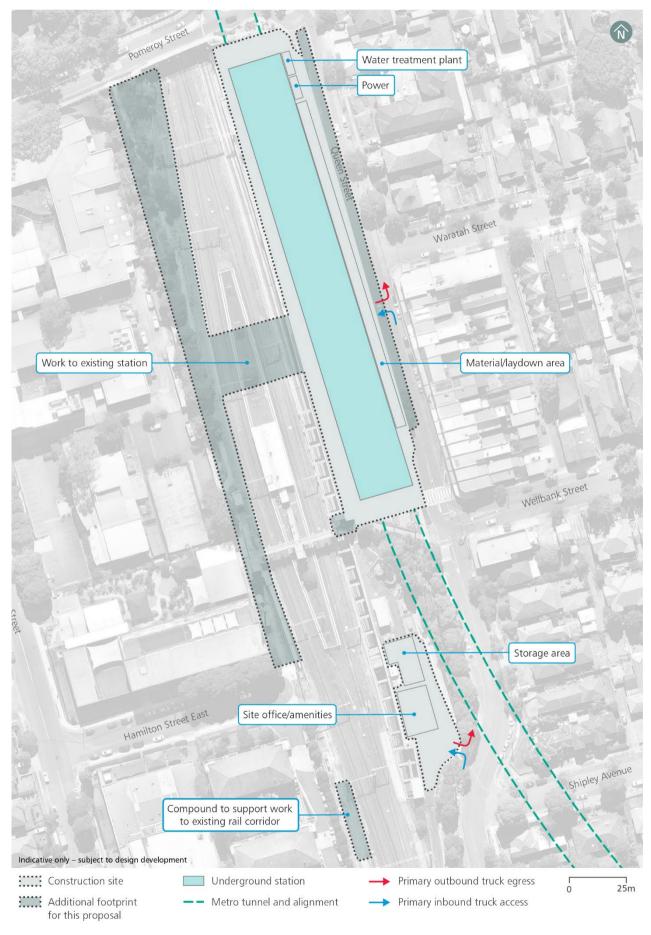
Indicative construction sites layout – North Strathfield metro station
